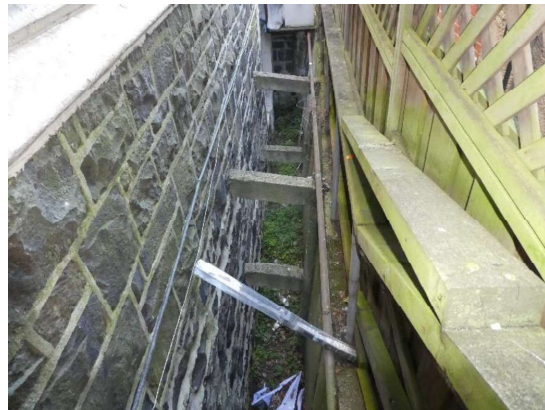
Showing the concrete braces buttressing the retaining wall to the western elevation.
